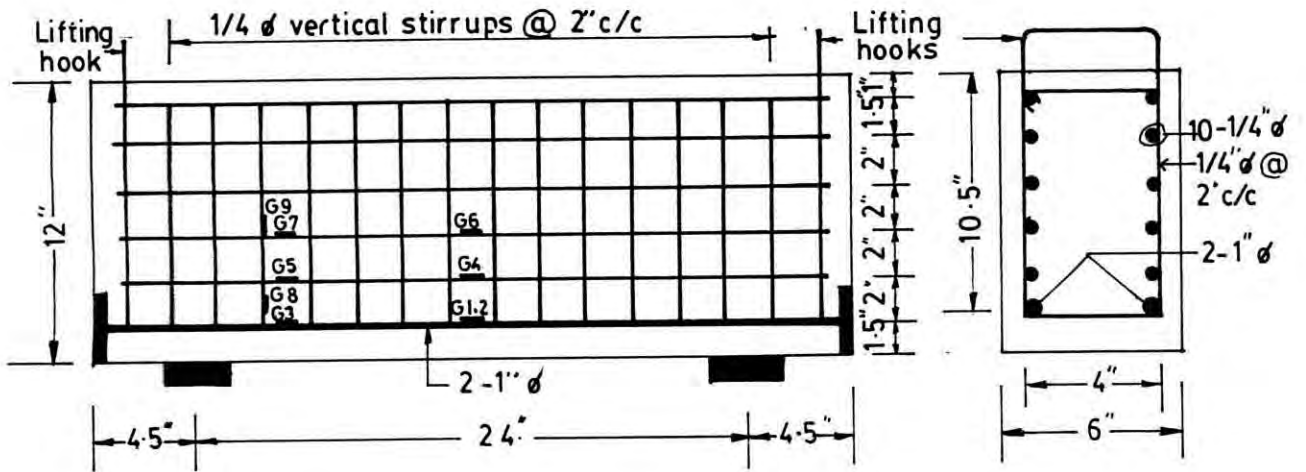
Reinforcement arrangement of beam DB - Q3
